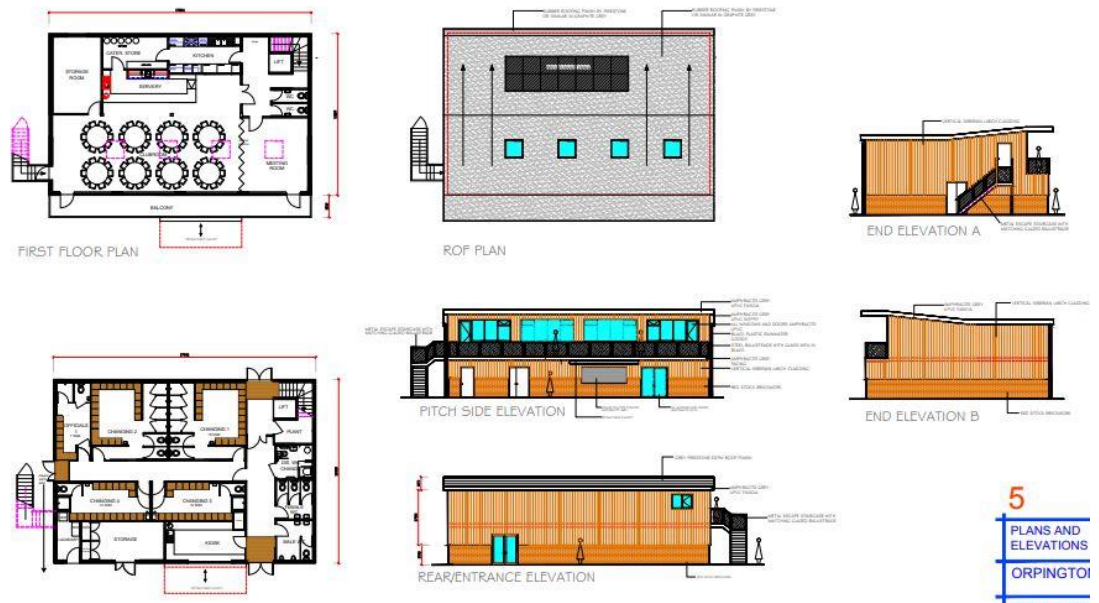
Proposed pavilion floor plan and elevations – current application (23/02527/FULL1).
